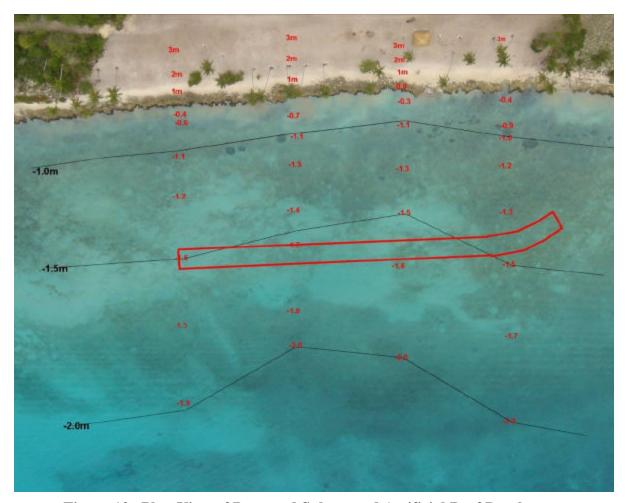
Plan View of Proposed Submerged Artificial Reef Breakwater
